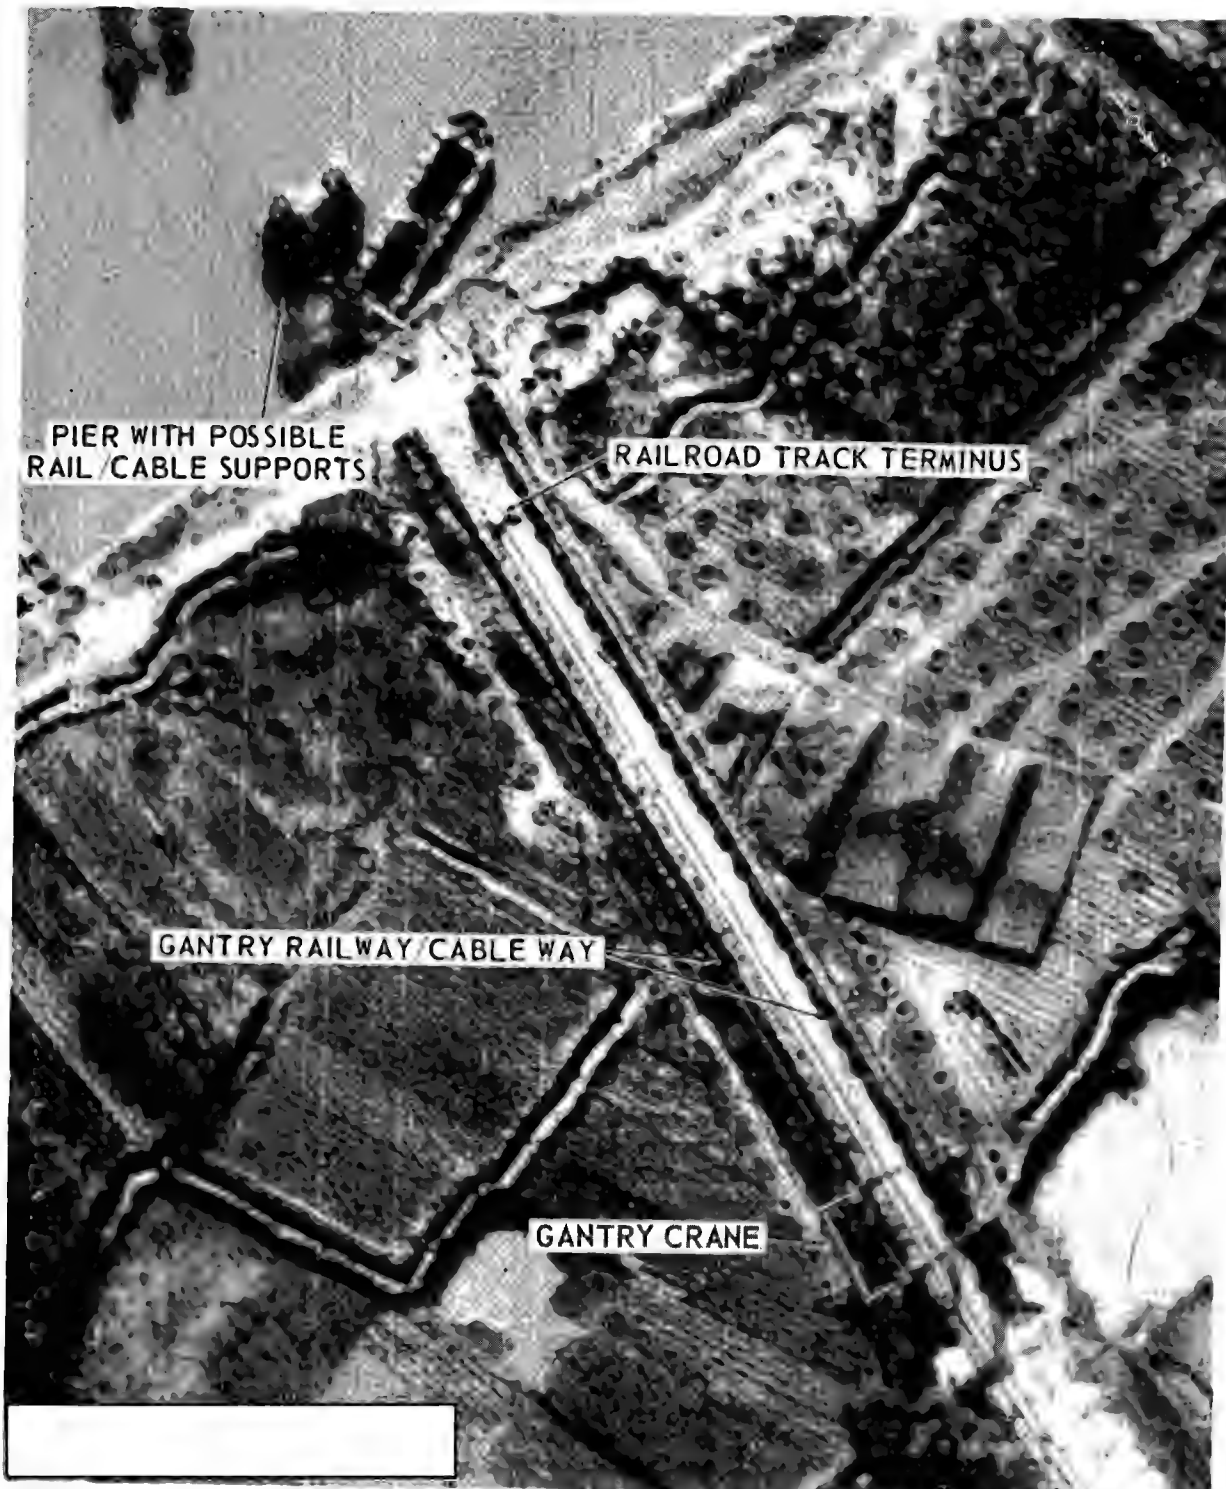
RAILROAD BRIDGE UNDER CONSTRUCTION, HA NOI/PING-HSIANG RAIL LINE, NORTH VIETNAM
